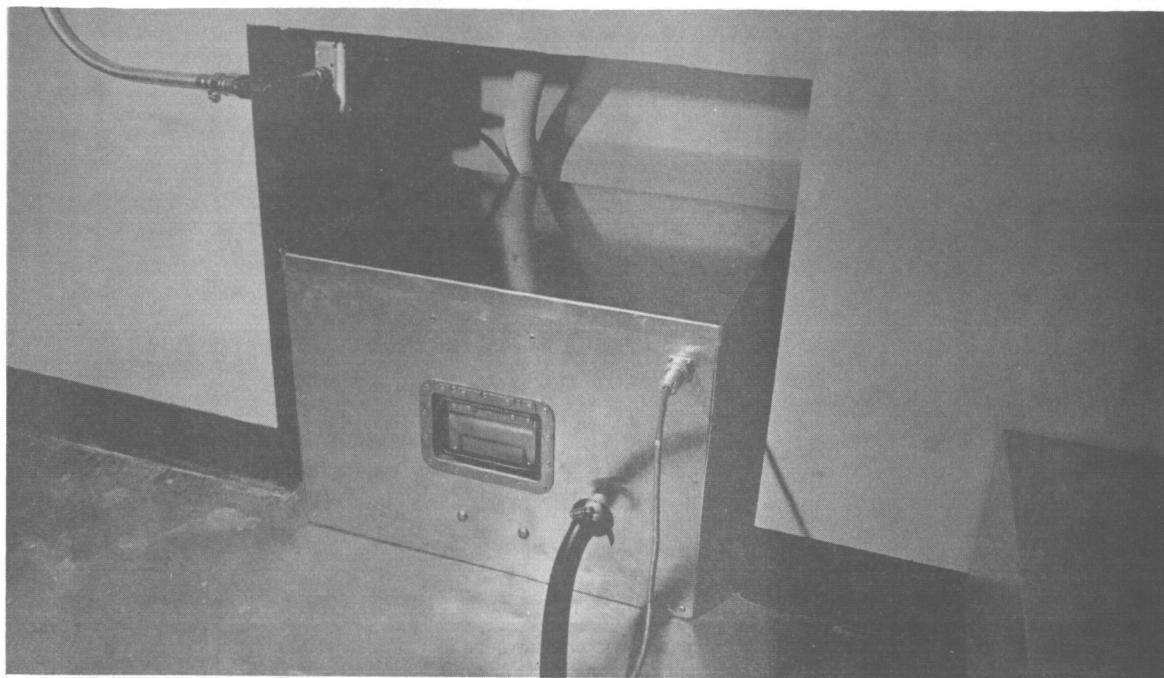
(Above) Valve Assembly (vacuum input shown on the top; outputs at the bottom; control cable at the top right.)
